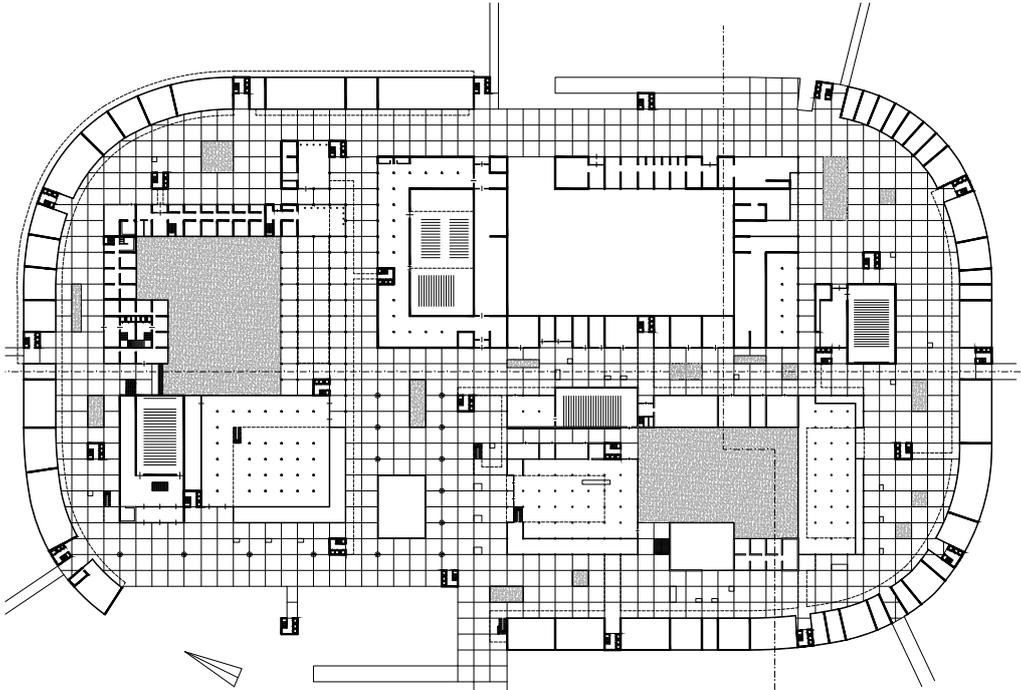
Re-drawn floor plan (Image: Eva Sollgruber).
